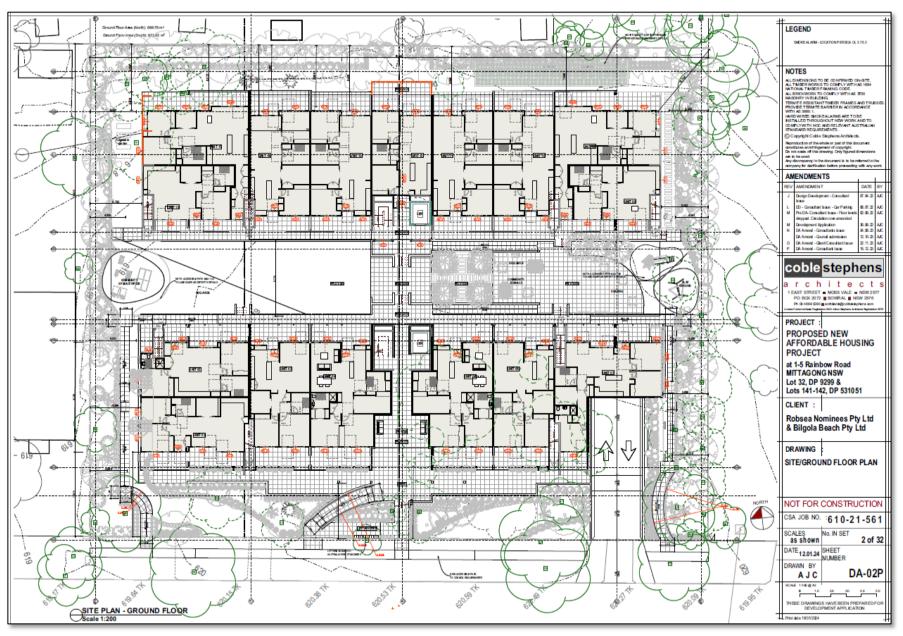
Showing the proposed Site/Ground Floor Plan.
